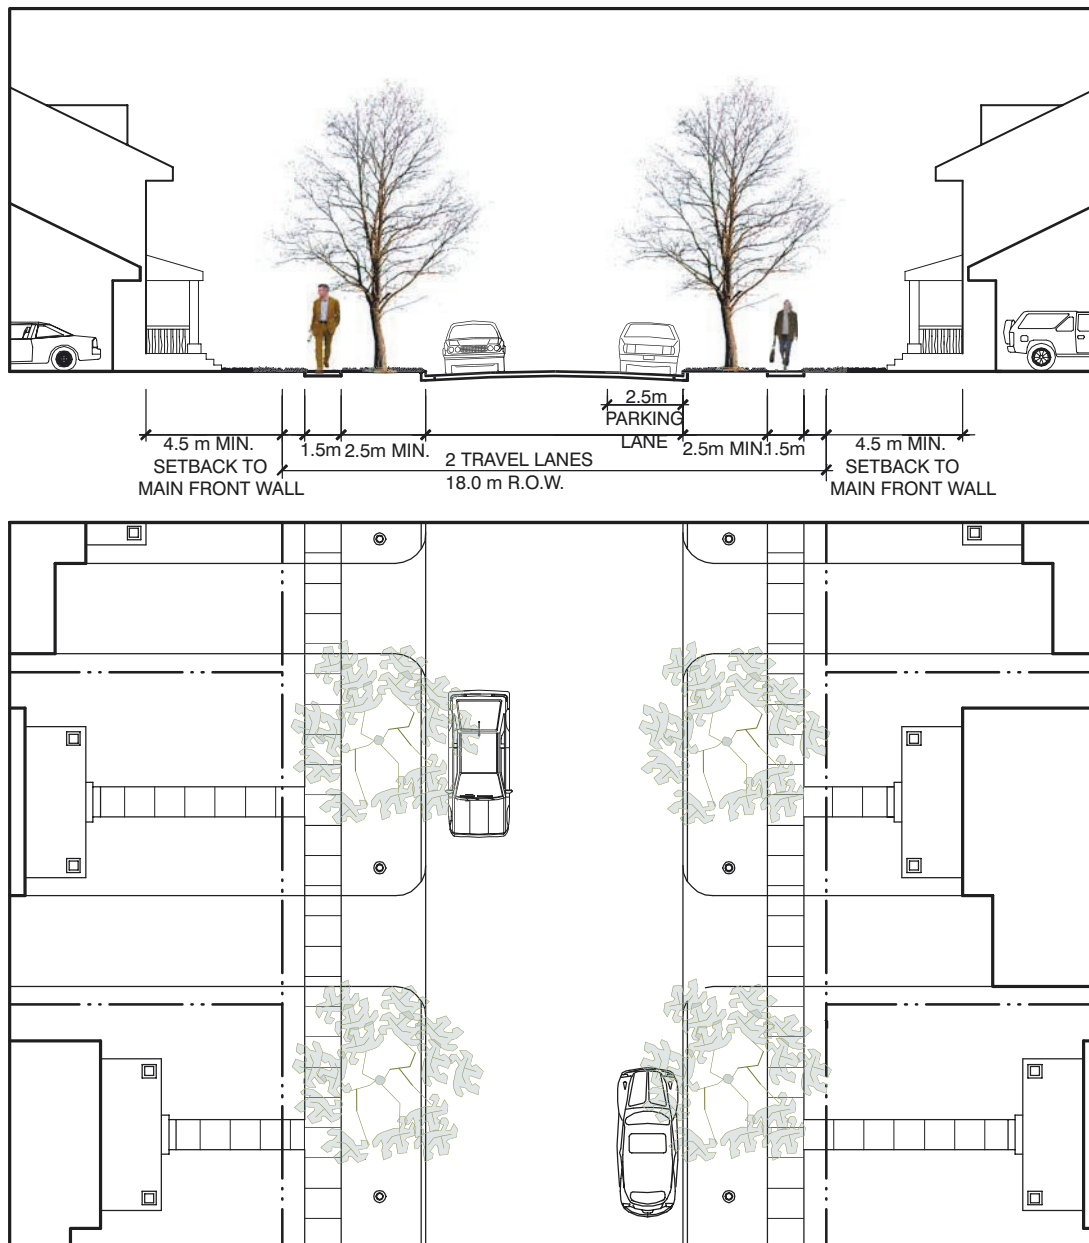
Section and plan that shows typical local road setback for new residential community
